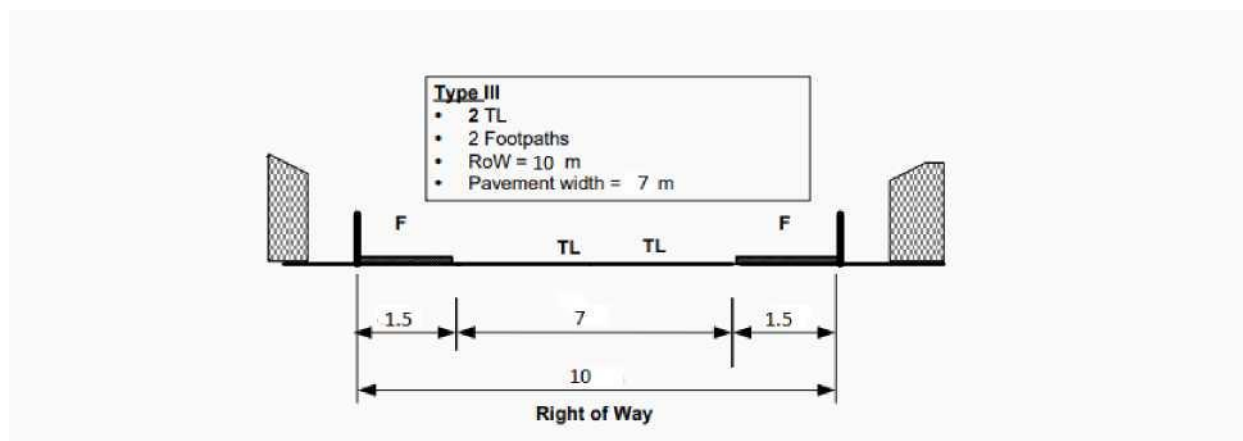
Typical Cross-section for Class B Roads (with RoW 10 m)
